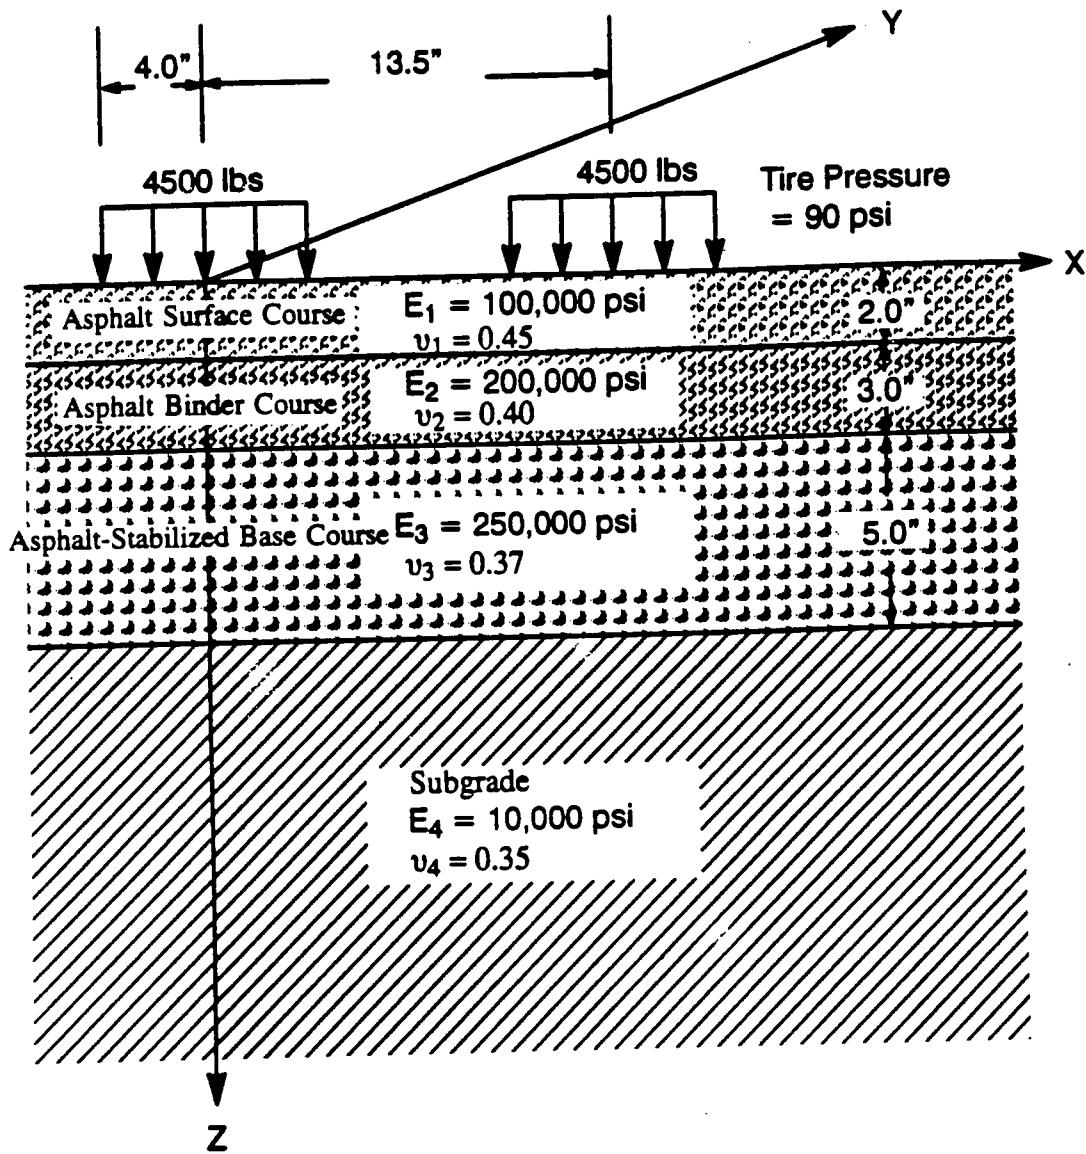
(c) Typical asphalt concrete pavement design type with full depth AC course.
